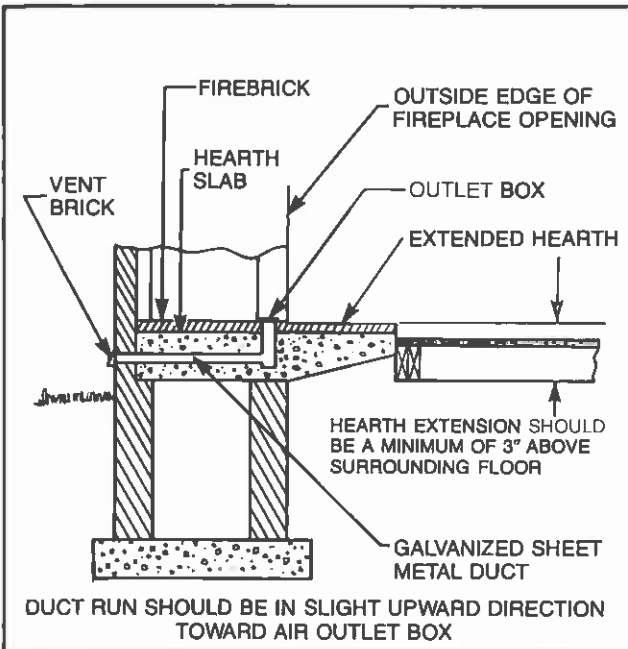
Install Air Outlet Box, build hearth slab and extended hearth.
